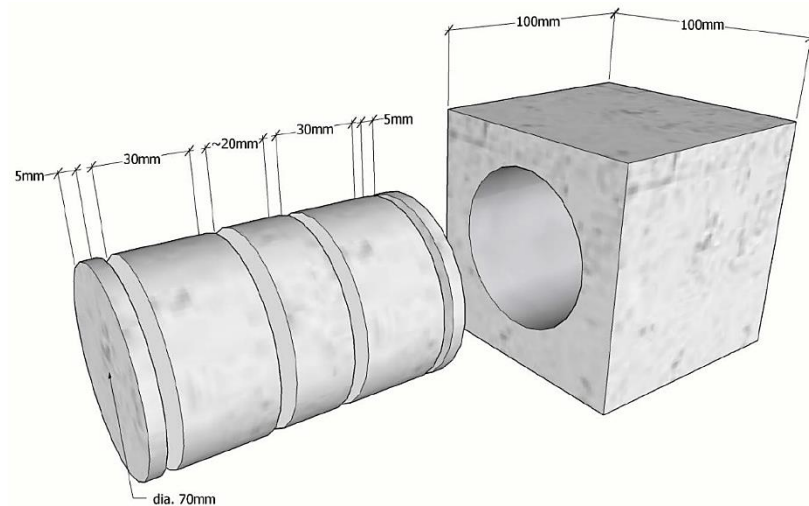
Details for cutting the concrete test specimens (Source: CoMSIRU, 2018)
